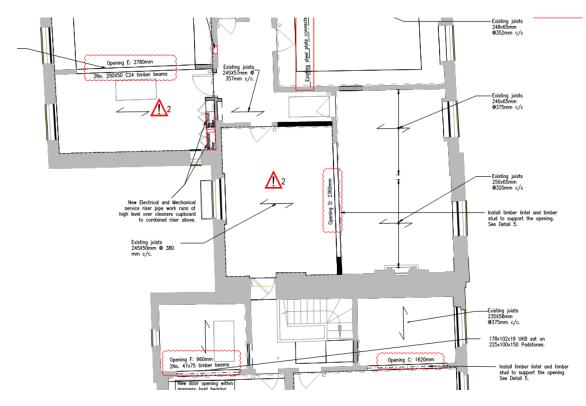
Extract from third floor drawing showing reduction of opening widths minimising structural interventions (refer to Appendix 2, BDP Drawing (20))AP005_WorkInProgress)
